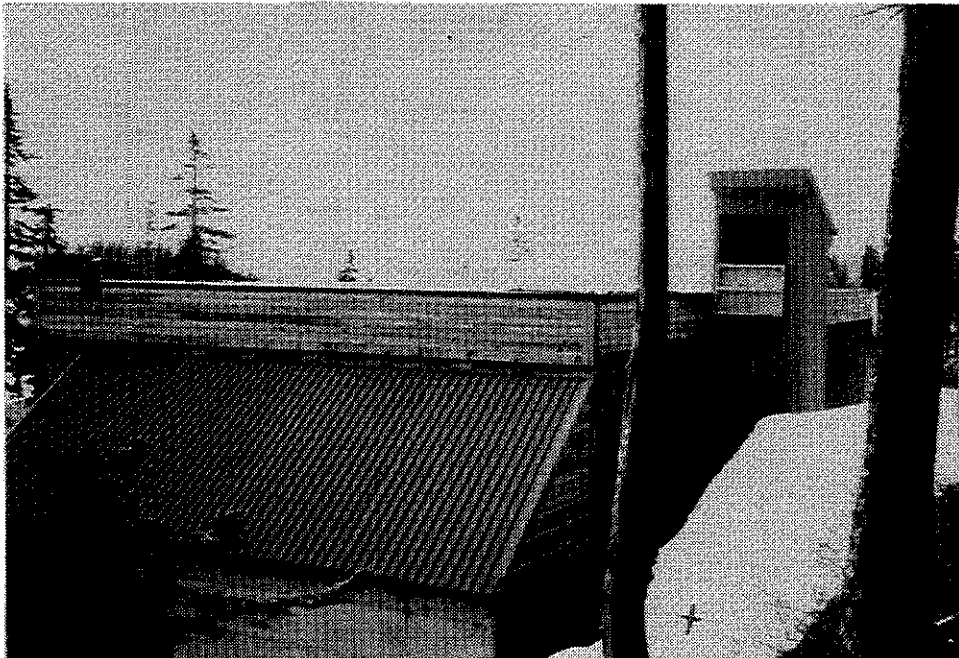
Wooden escape hatch at back door of building (against hill). Snow is usually very deep there. Note two door openings in hatch.
